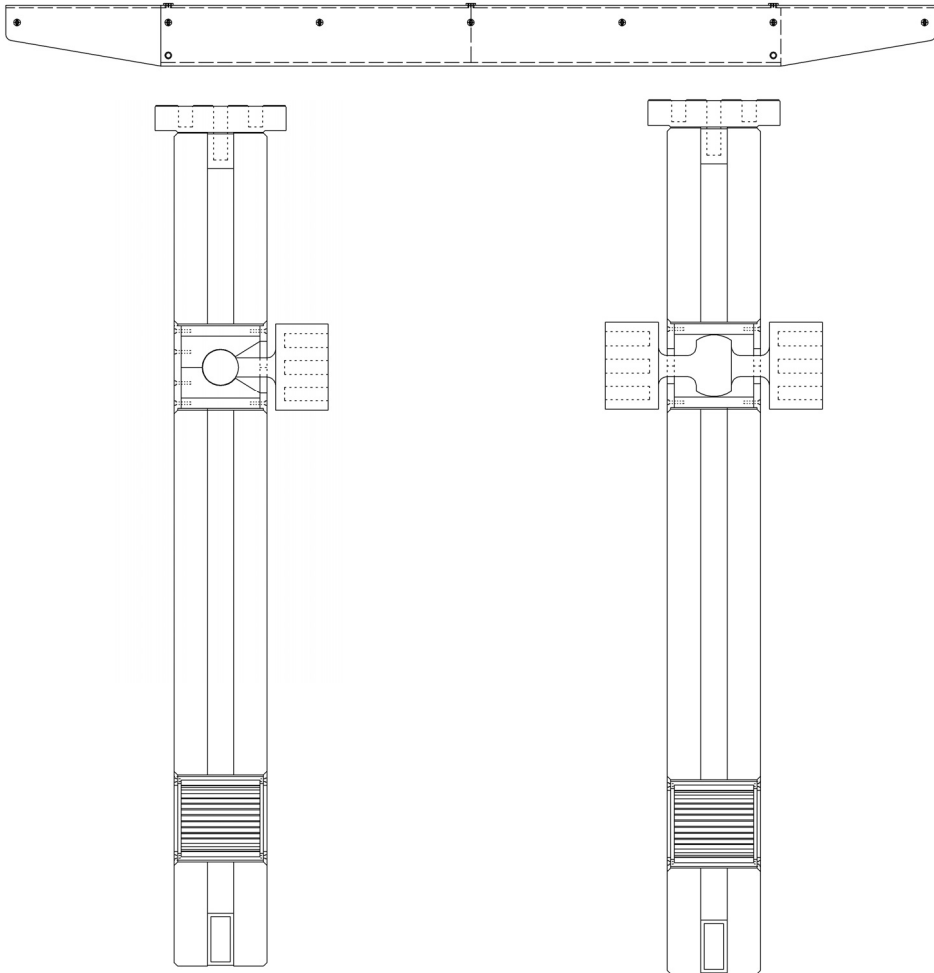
c ATP main beam: longitudinal view of end beam, section of end beam, section of mid beam.
